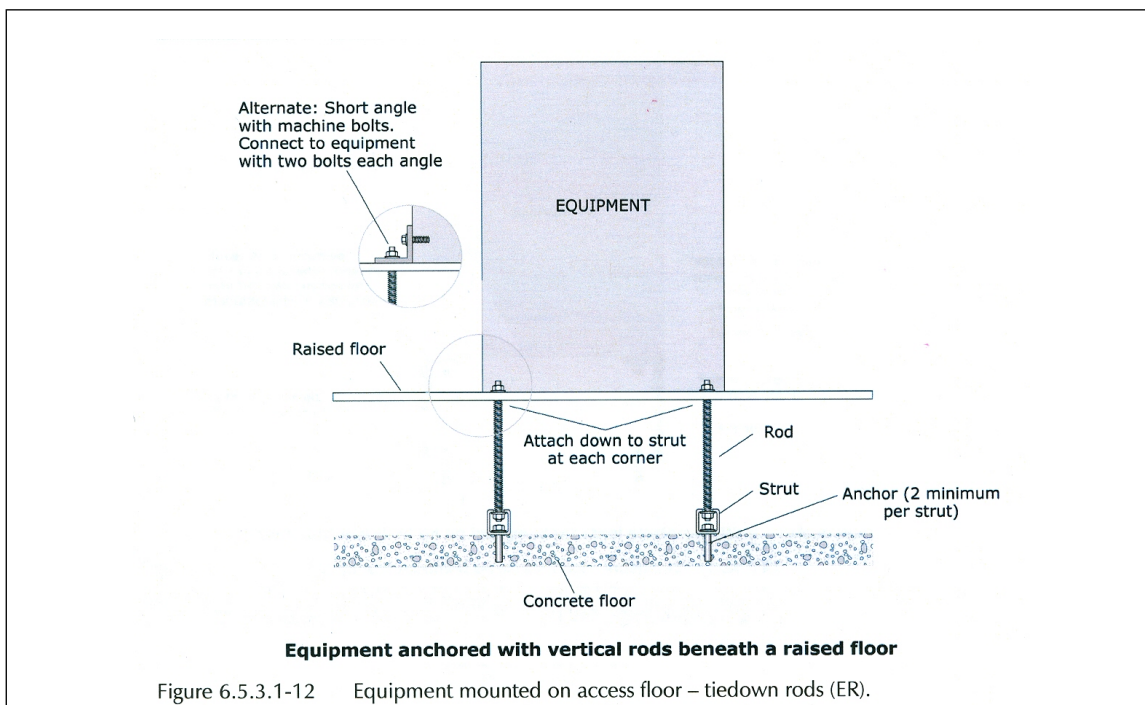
B. Example of equipment supported on raised access floor, restrained with vertical rods to the structural floor (Figure 6.5.3.1-12 from FEMA E-74)
